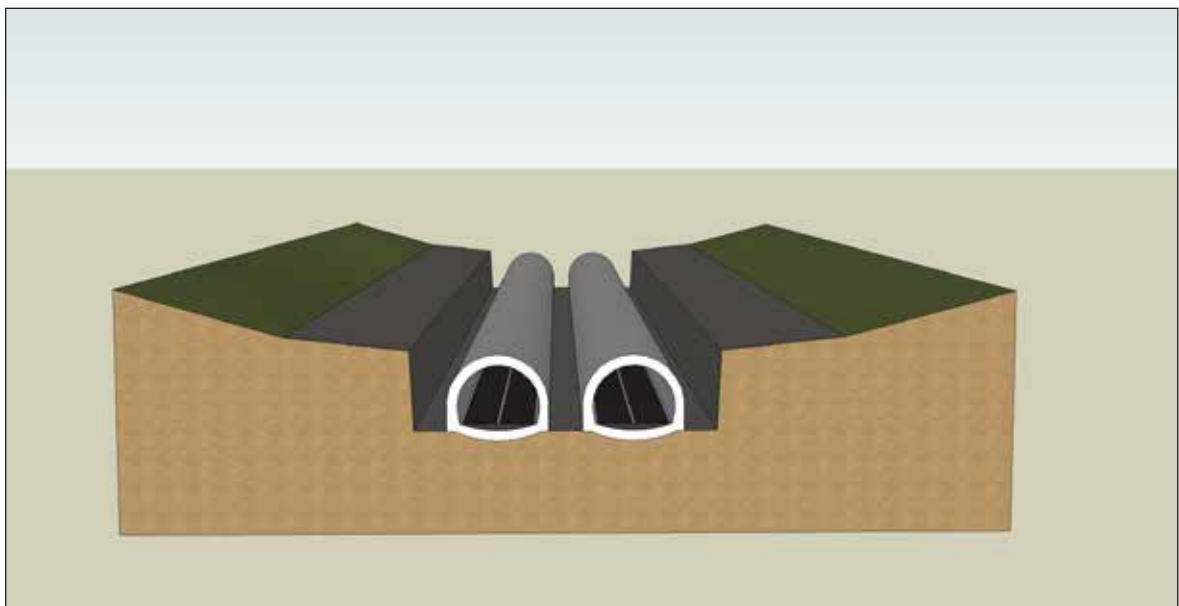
Sketch of worksite after stabilization of the walls and before demolition of the tunnels.
